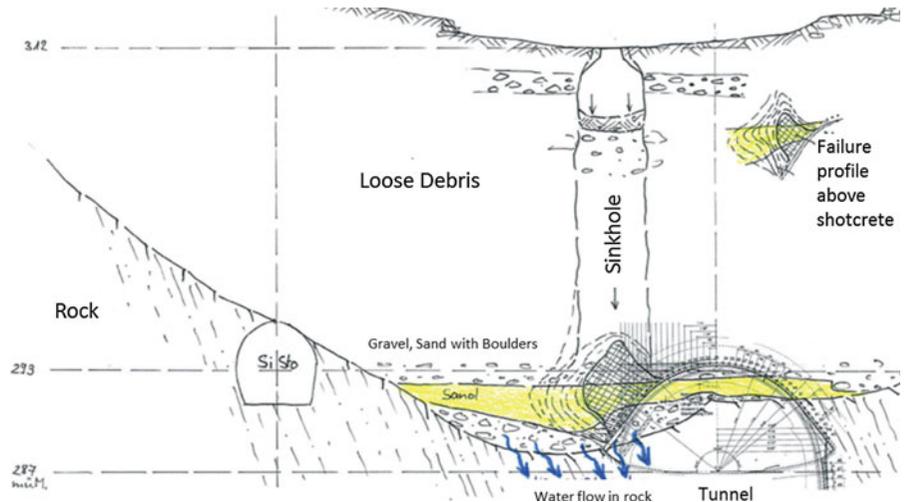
Over excavation of the pilot tunnel in the south bound tunnel, December 2012
